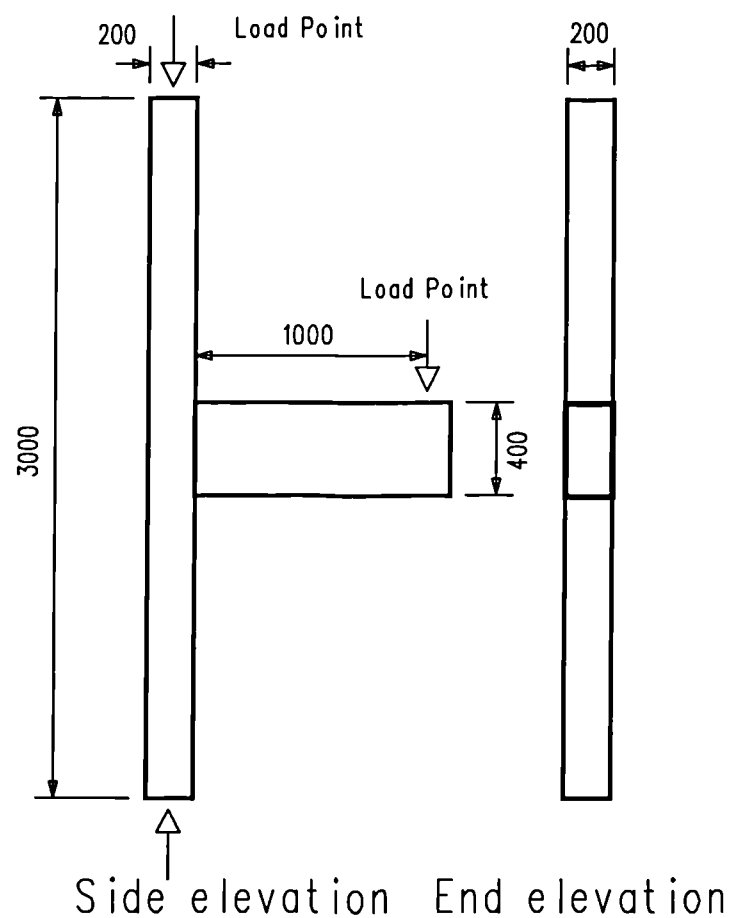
Specimen layout (dimensions in mm) - Kordina [6]
